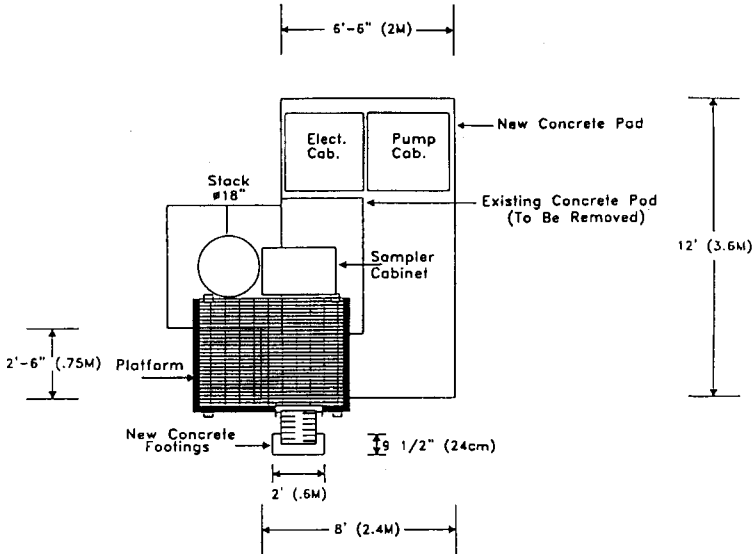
244-CR Vault GEMS Upgrade - Plan View of Equipment Layout
